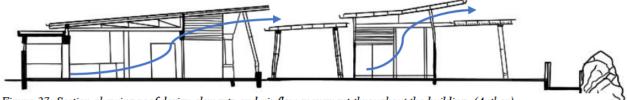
Section showing roof design elements and air flow movement throughout the building. (Author)
